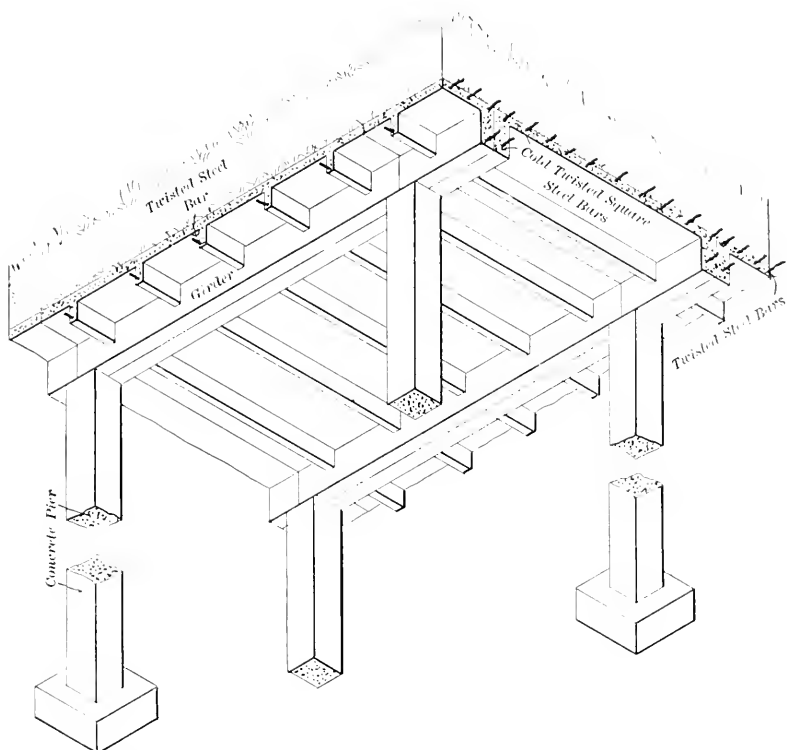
DESIGN FOR ROOF OF SEPTIC TANK. ISOMETRIC VIEW OF TYPICAL BAY.
